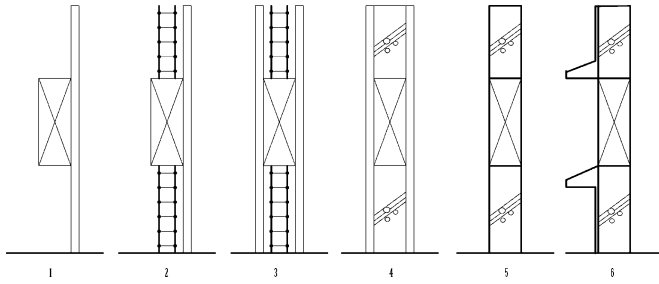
Proposed design. Notes: 1) Internal form erection: Forms for the inner part of wall are erected. Window boxes are embedded in this step to shape the window opening. 2) Installing reinforcing bars for the wall construction: After internal forms are erected, rebar work for wall starts. 3) External form erection: Ganged forms for the outer part of wall are erected. Productivity will increase significantly because the window side does not need to be cut. The ganged form system also has higher productivity than the conventional wooden formwork system. 4) Pouring and curing concrete: Concrete is poured into wall and cured until it reaches the required strength. 5) Removing forms: Forms are removed and cleaned for the use of the next cycle once concrete reaches the required strength. 6) Awning setting: Awnings are formed by using EIFS. Since this activity is not included in the critical path of the project, the total duration of one cycle can be reduced significantly. Also, the productivity of setting EIFS is much higher than that of setting form and pouring concrete for awnings.
